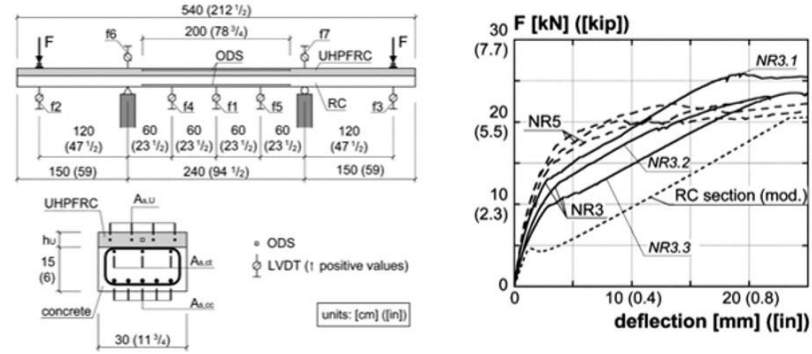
Test set-up of composite beam and force-deflection response of tested beams [29]
